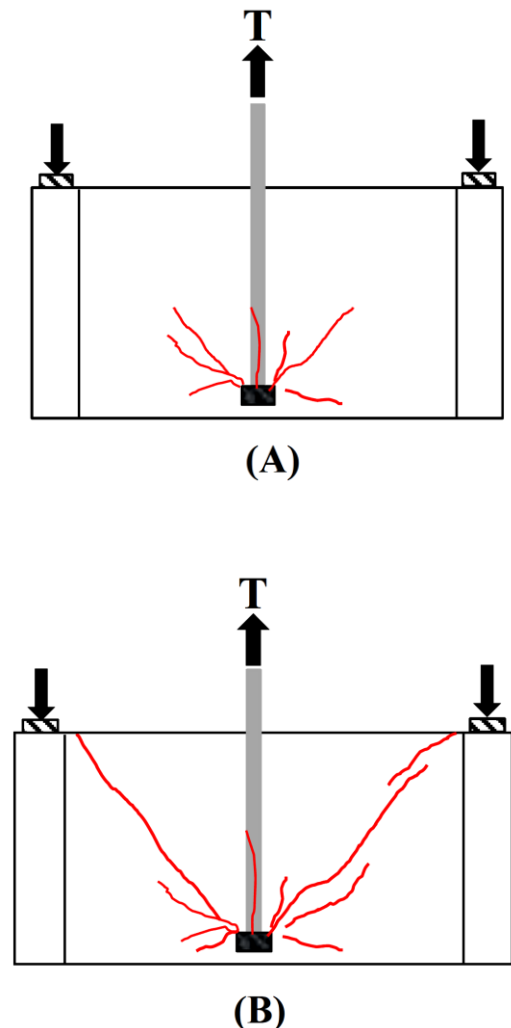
Cracks Propagation in Single Headed Bar Specimens in Pullout Tests (A) Initial Crack (B) Cracking at Failure.
